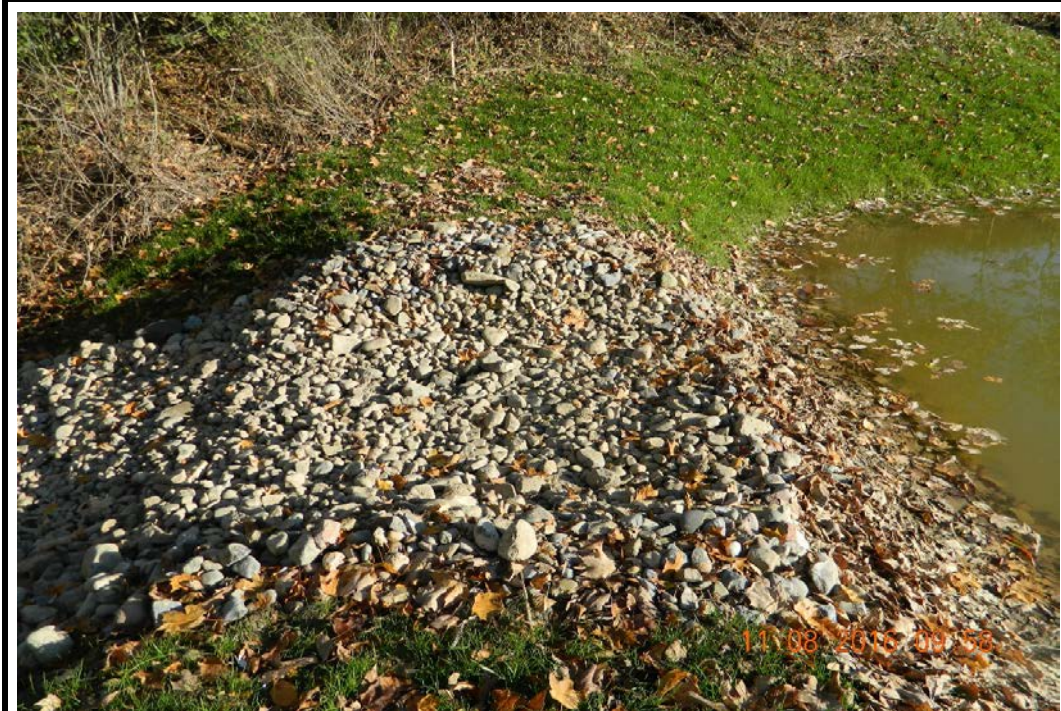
Sediment Trap 1 outlet, looking north (11/8/16)
